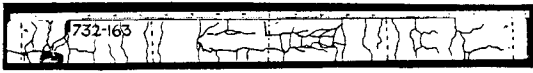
Longitudinal cracks in the concrete cover following a tensile overlap splice in a beam [76].
